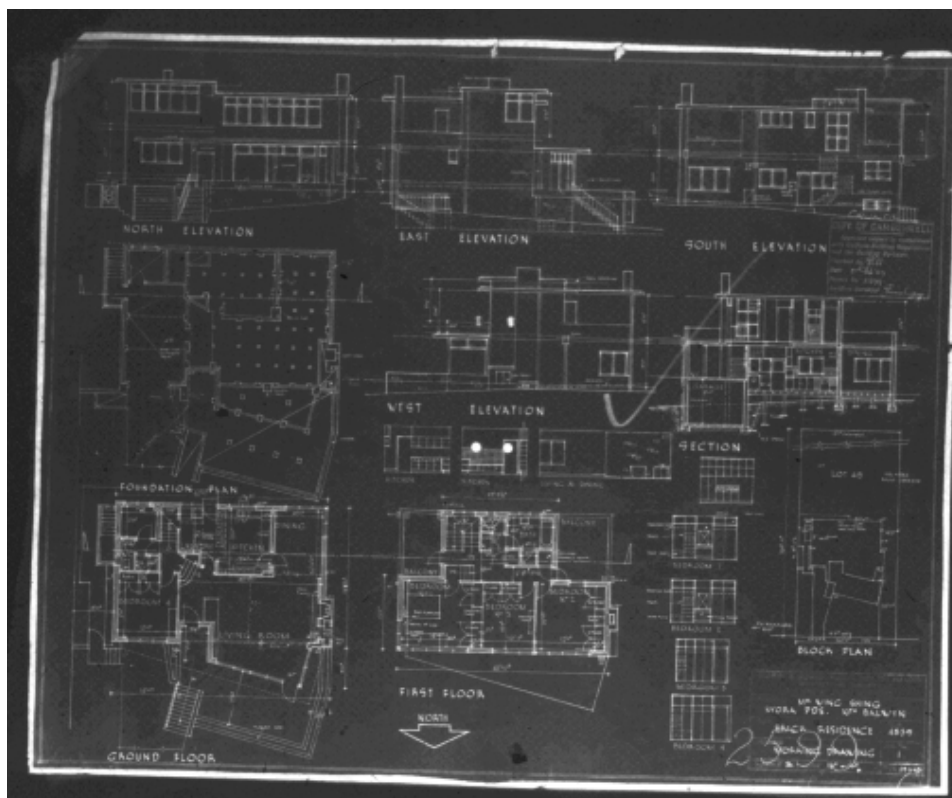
working drawing for 26 Kyora Parade, Balwyn North showing floor plan, elevations, section, block and bedroom cabinetry (Source: BP 2599)
